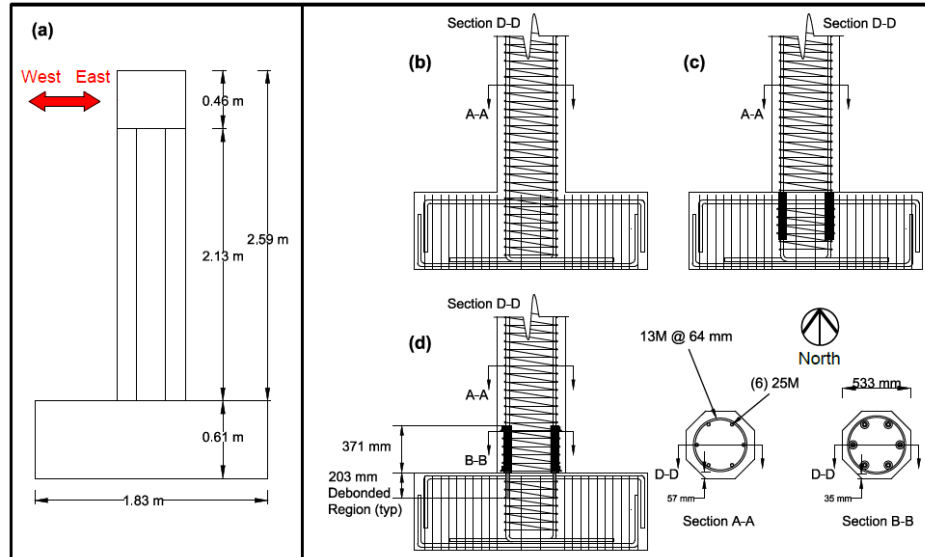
Specimen details: (a) Subassembly dimensions, (b) CIP, (c) Precast-1, and (d) Precast-2
